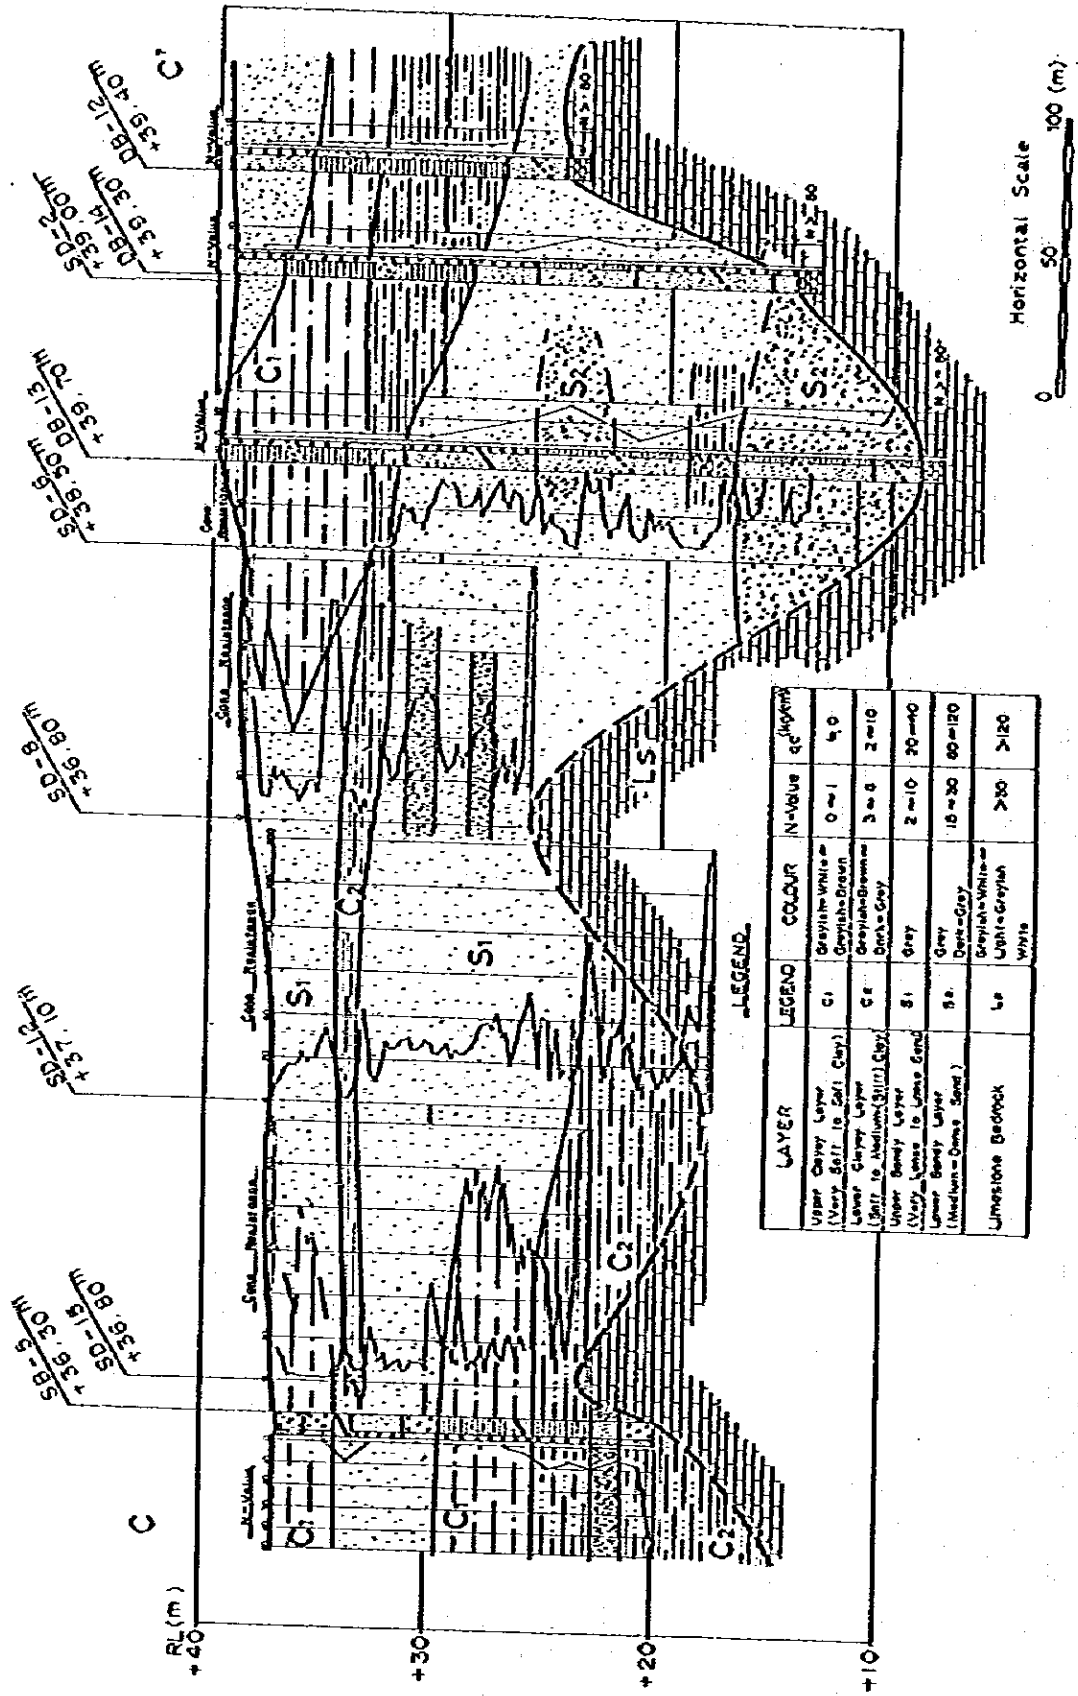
Soil Profile at Sentul, Cross Section C-C'
